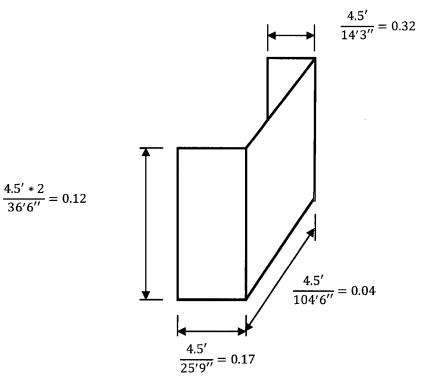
Floor Thickness/Span Length Ratio for Slabs Located in the CW Building
